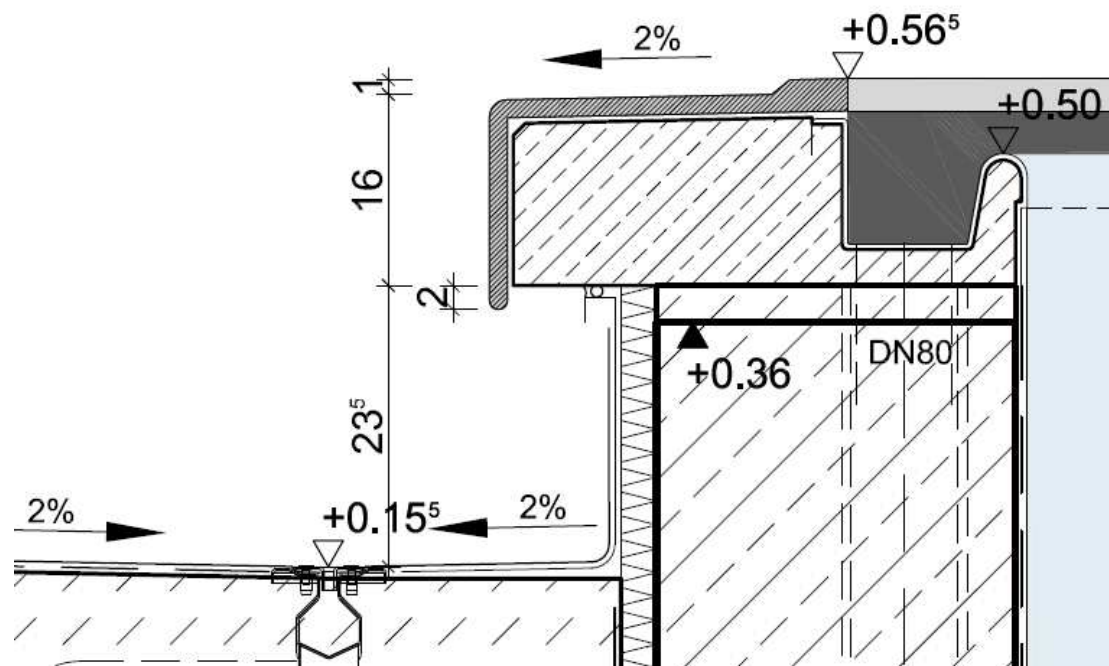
Vertical section of the pool head and pool surround, slot channel in the pool area with a slope, floor cross slope to the slot channel, connection of the PVC floor covering to the slot channel by means of a clamping flange, seamlessly raised flooring on the pool wall (tub formation via fillet), pool head designed as a seat. The plastic floor covering can be connected tightly to the slot channel using a clamping flange (source: ntspv).
